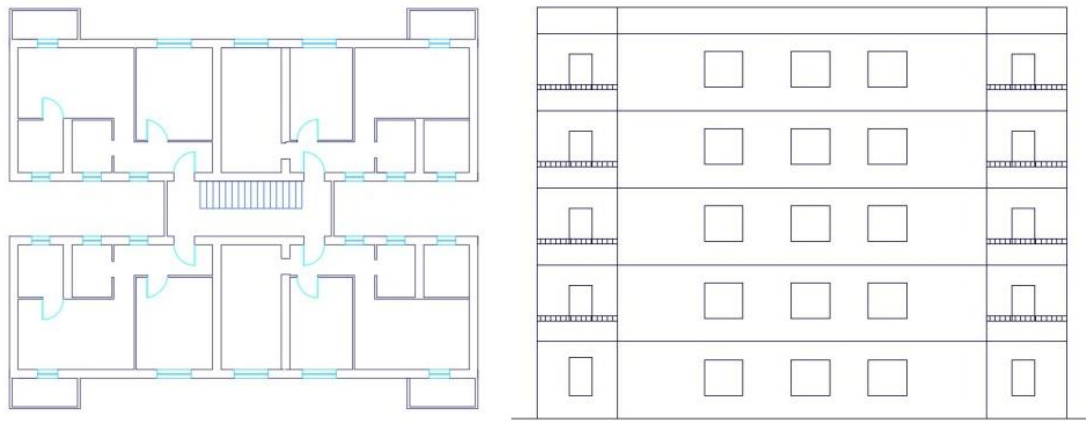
Building C3 plan view and facade view [AQTN, 2018]
